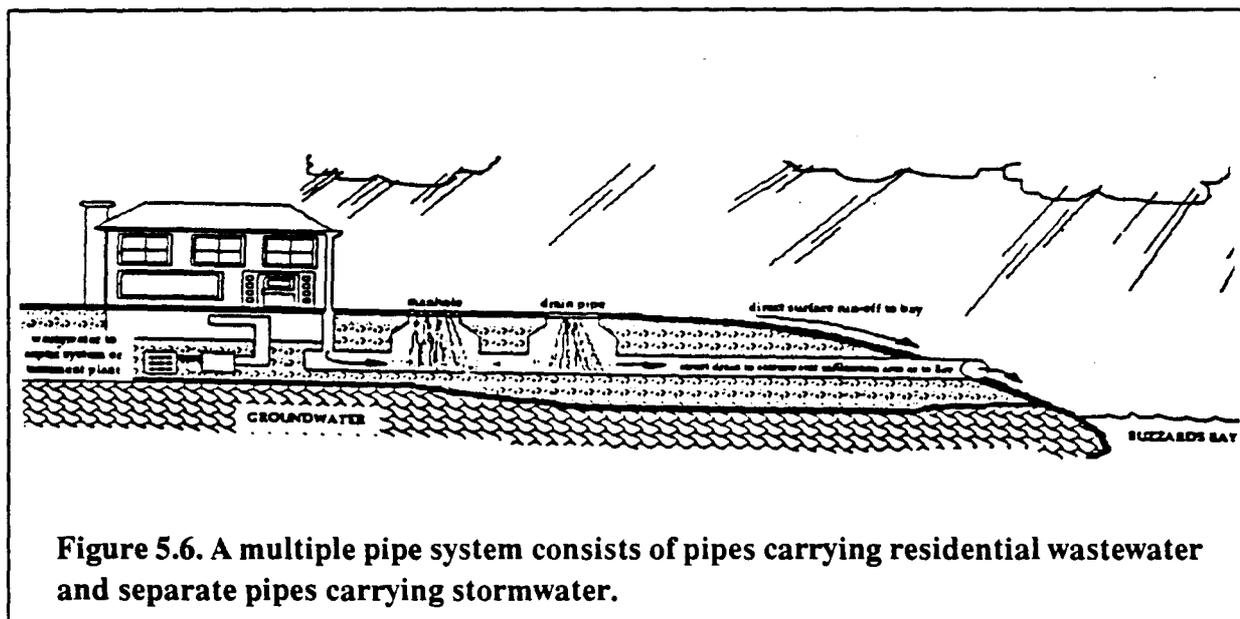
A multiple pipe system consists of pipes carrying residential wastewater and separate pipes carrying stormwater.
